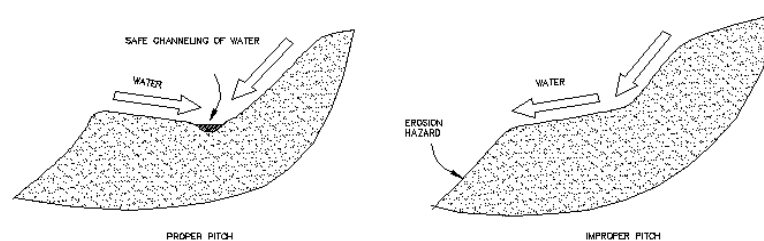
Hillside Pitch of Roadway and Proper Ditch Location
